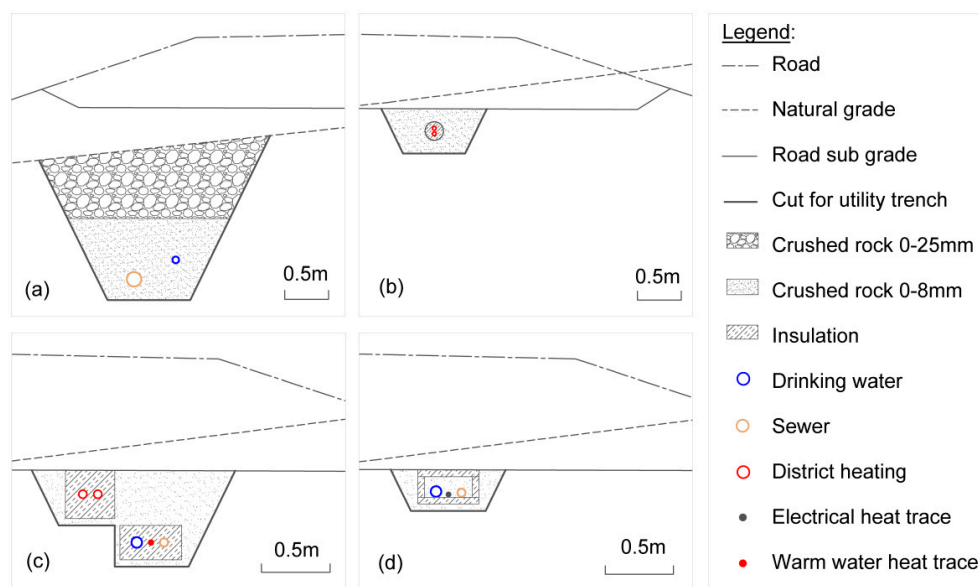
Trench layout under the main road in Repisvaara South II for (a) gravity sewer and drinking water (Alternatives 1 and 4); (b) high-temperature district heating (Alternative 1); (c) LTDH, drinking water and gravity or LPS sewer with warm water heat trace for freeze protection (Alternatives 2 and 3); (d) LPS sewer and drinking water with electrical heat trace for freeze protection (Alternative 5).
